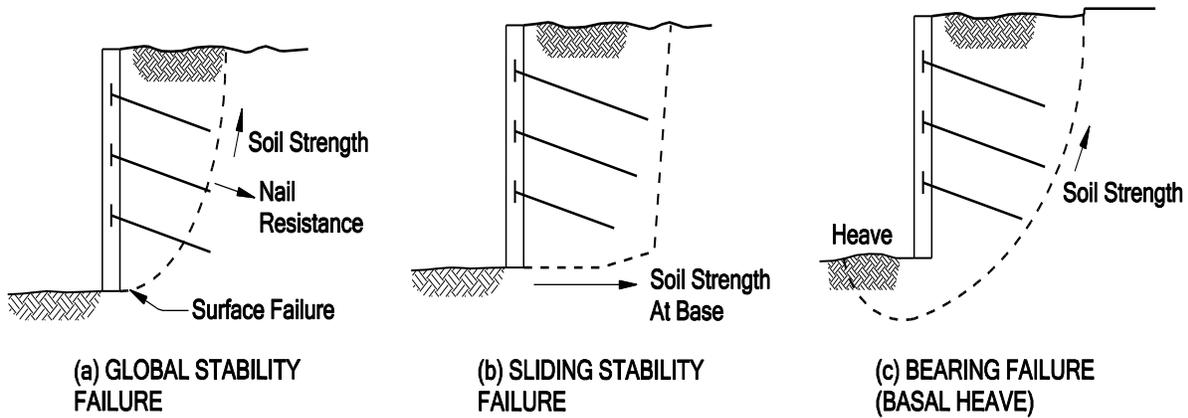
Soil Nail Walls: External, Internal, Global, and Facing Failure Mode
